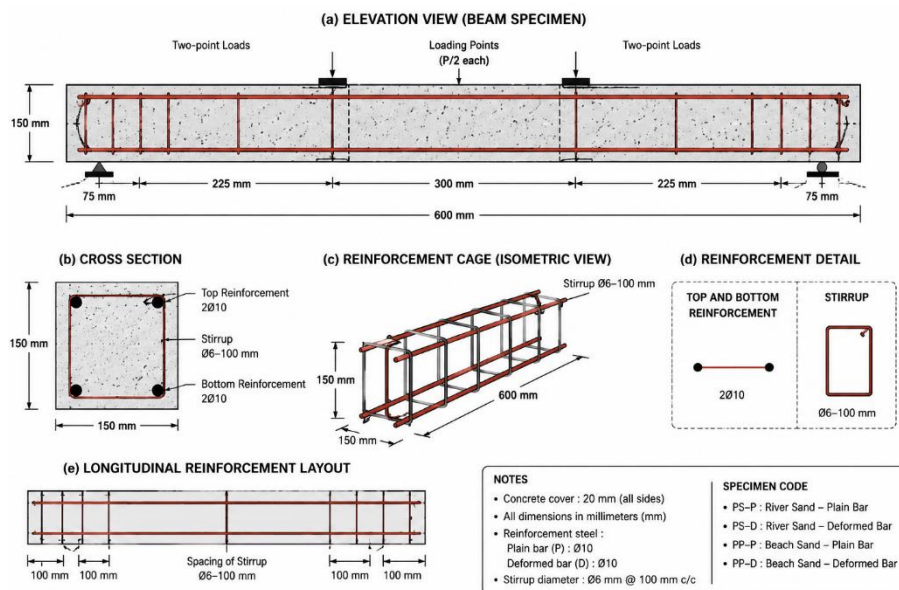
Reinforcement Detailing and Dimensions of Reinforced Concrete Beam Specimens
